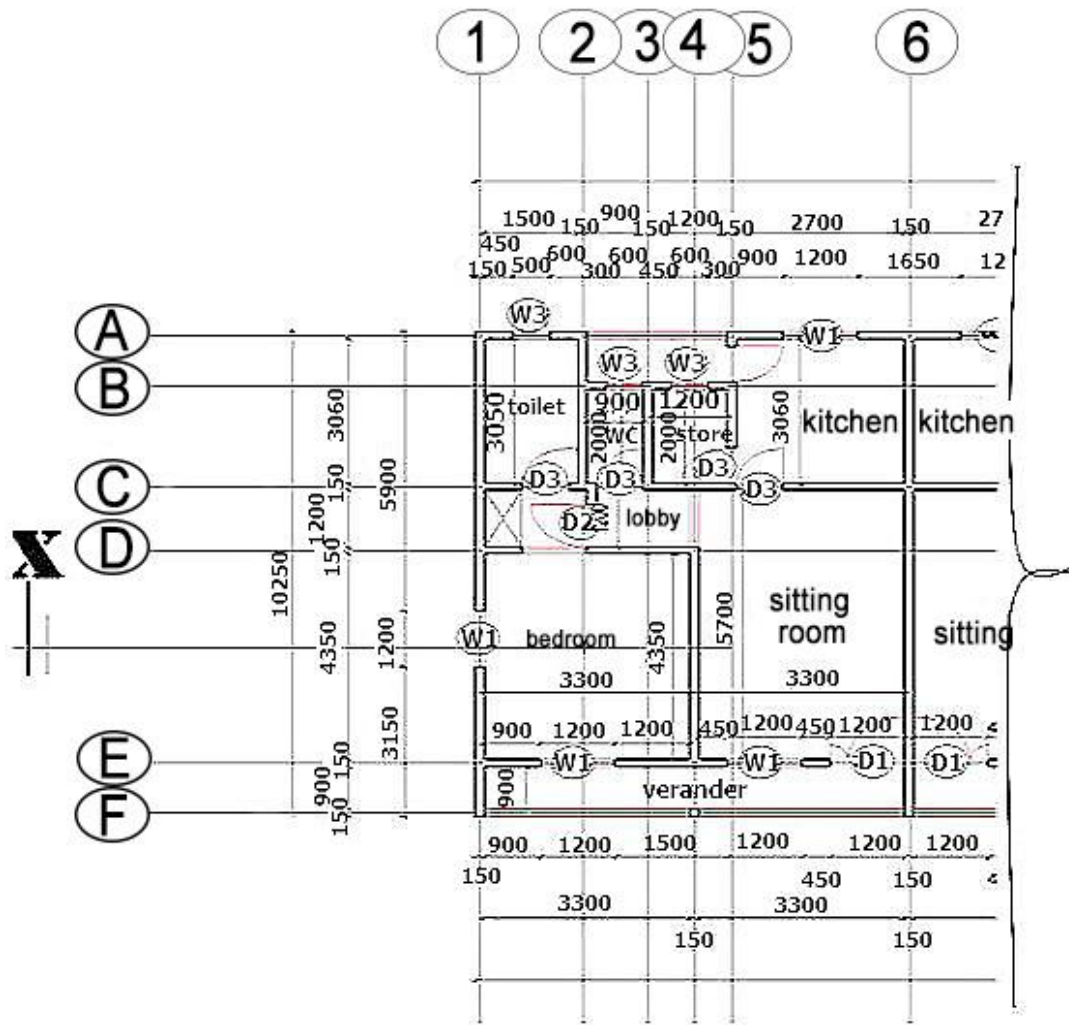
Typical Floor Plan of one (1) Bedroom house unit (details in appendix 1, 2 and 3)
